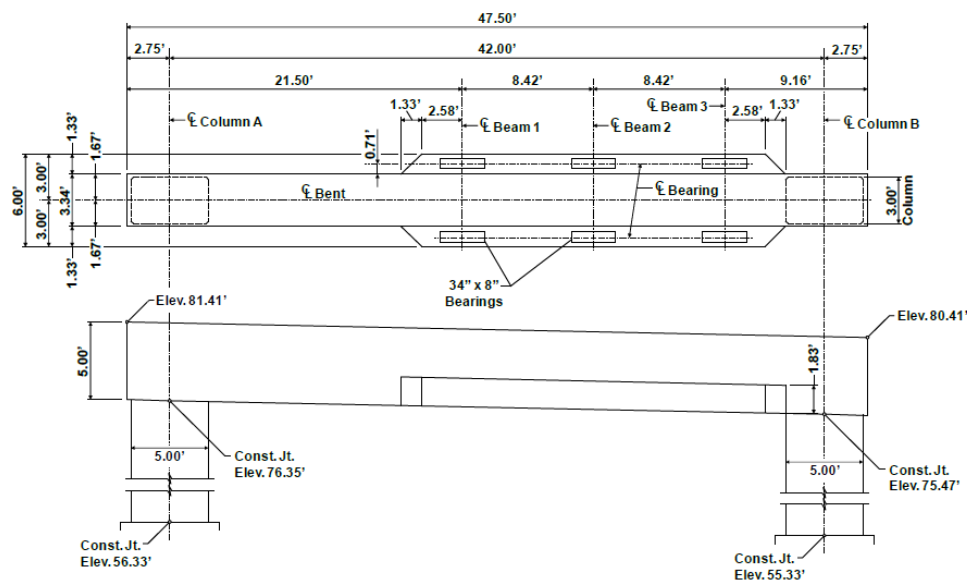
Plan and elevation views of inverted T bent cap (FHWA/TX-12/5-5253-01-1)
